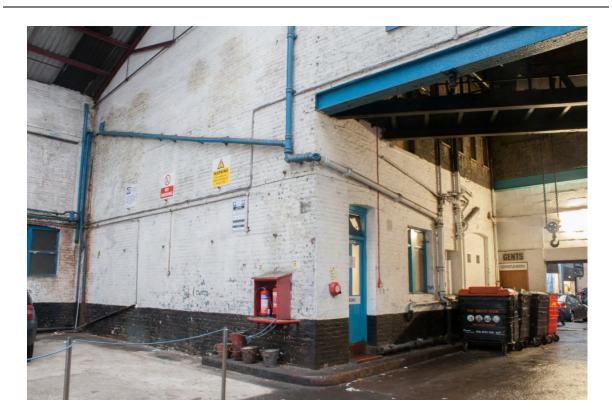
Passageway entrance leading from the parking area at the south-west end of the building to the main workshop area beyond, looking north (72FmLa D100 055)
